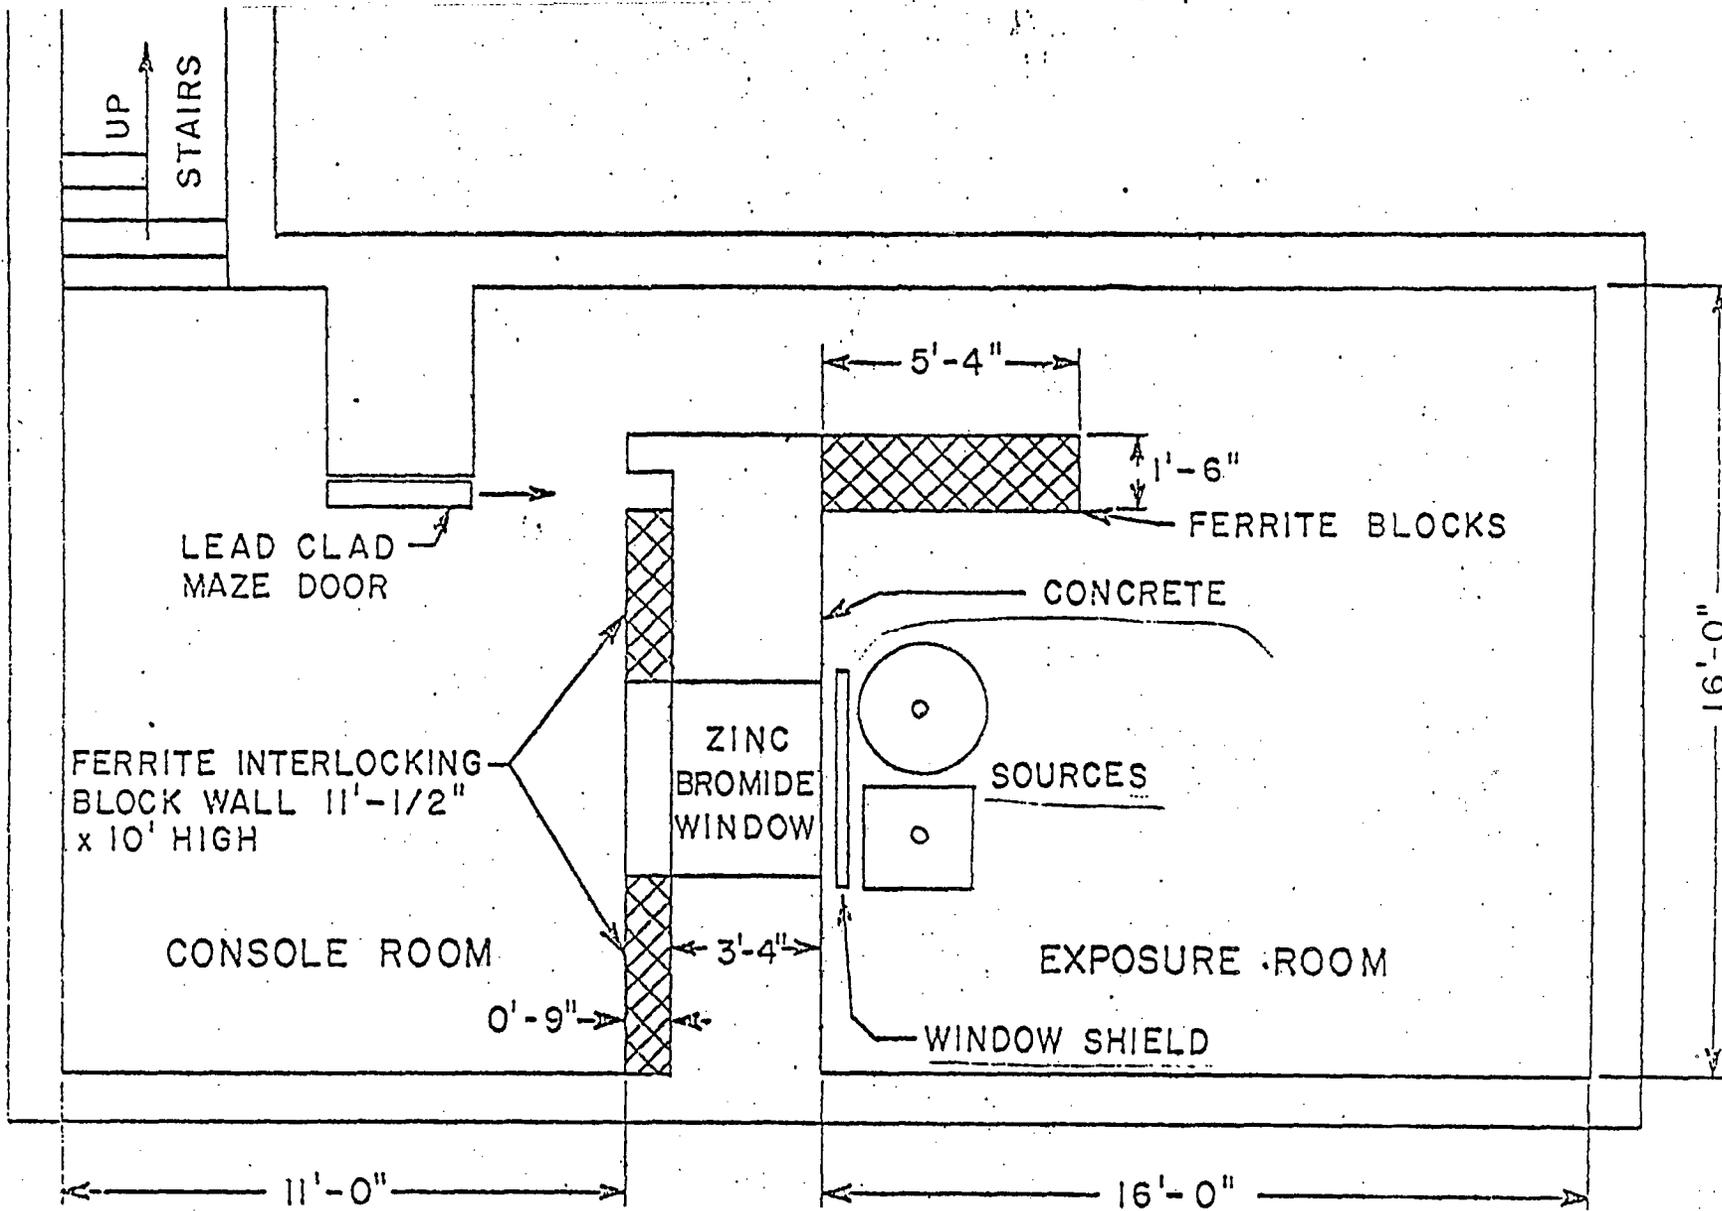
PLAN VIEW UNDERGROUND VAULT
